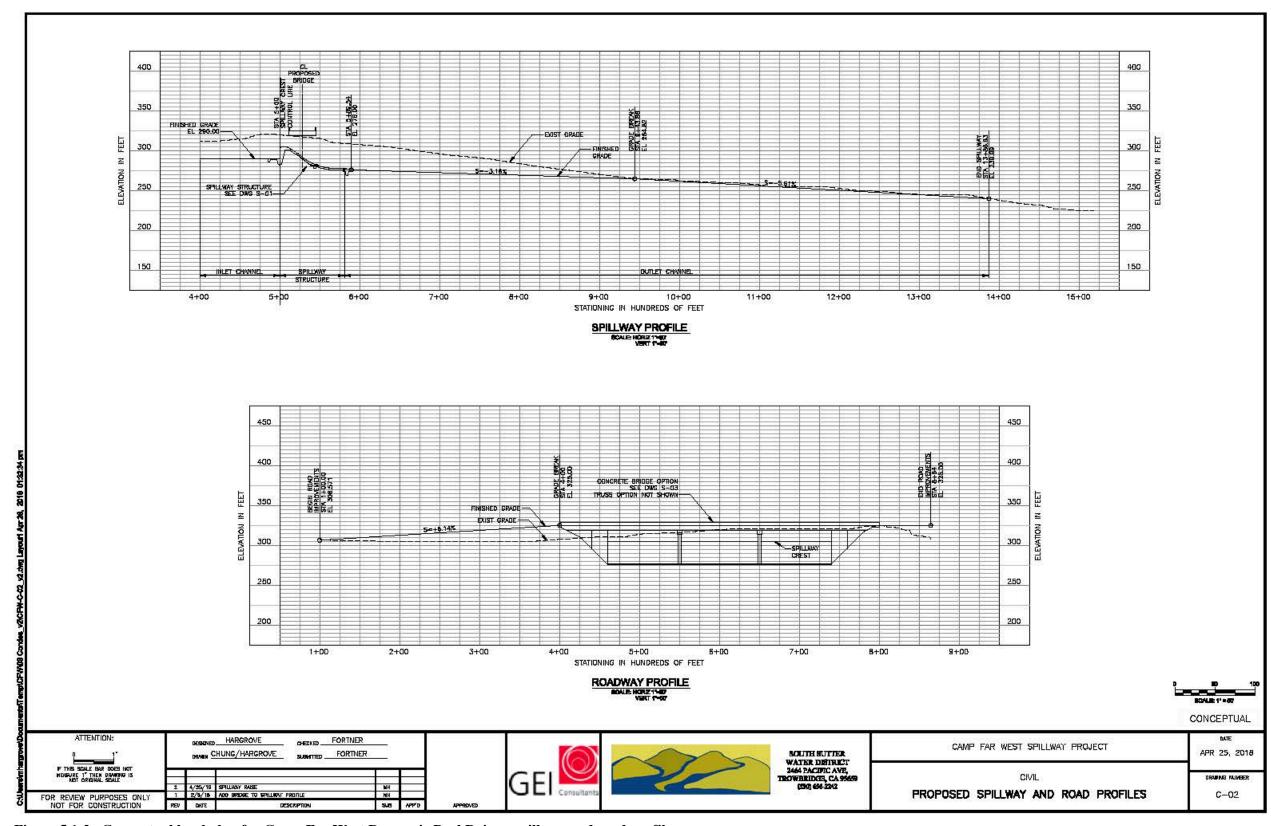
Conceptual level plan for Camp Far West Reservoir Pool Raise – spillway and road profiles.
